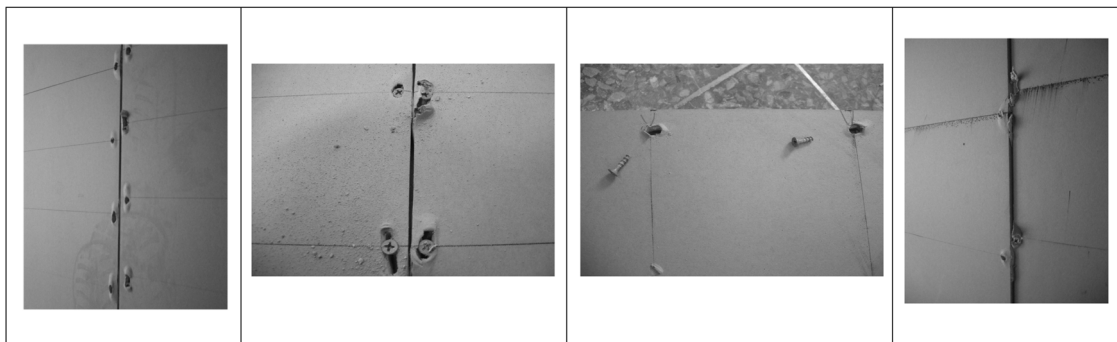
Failure of nailed joints of one side Gypsum borad shear wall (G12.5, G15).
